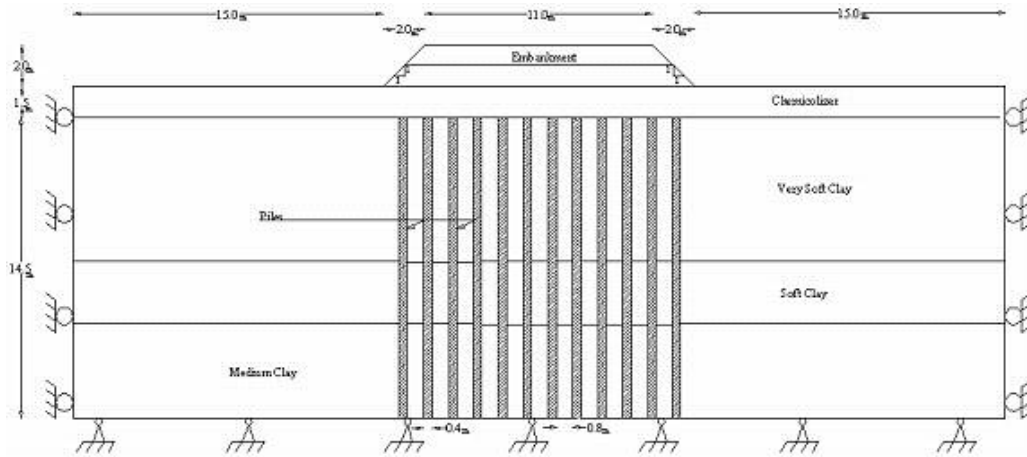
Finite Element Model of Pile Supported Embankment (Hossain, 1997)
